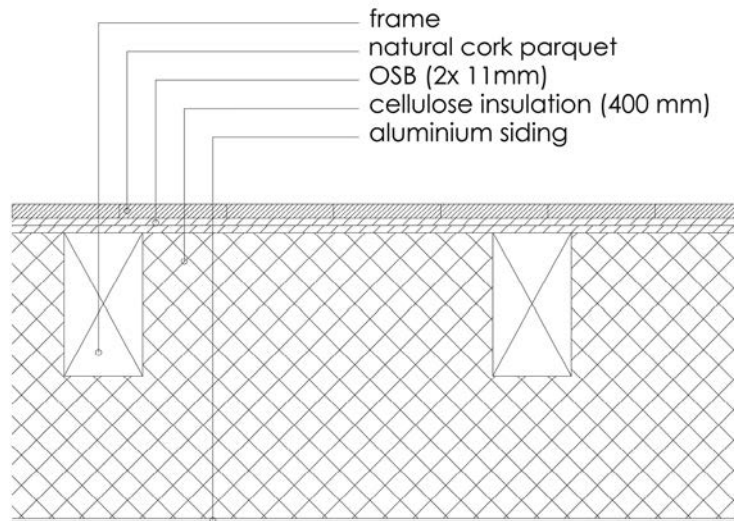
Ground-floor section, first-floor slab (interior/exterior) section.
